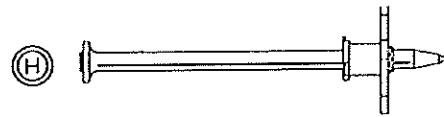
HILTI X-CP SILL PLATE FASTENER
